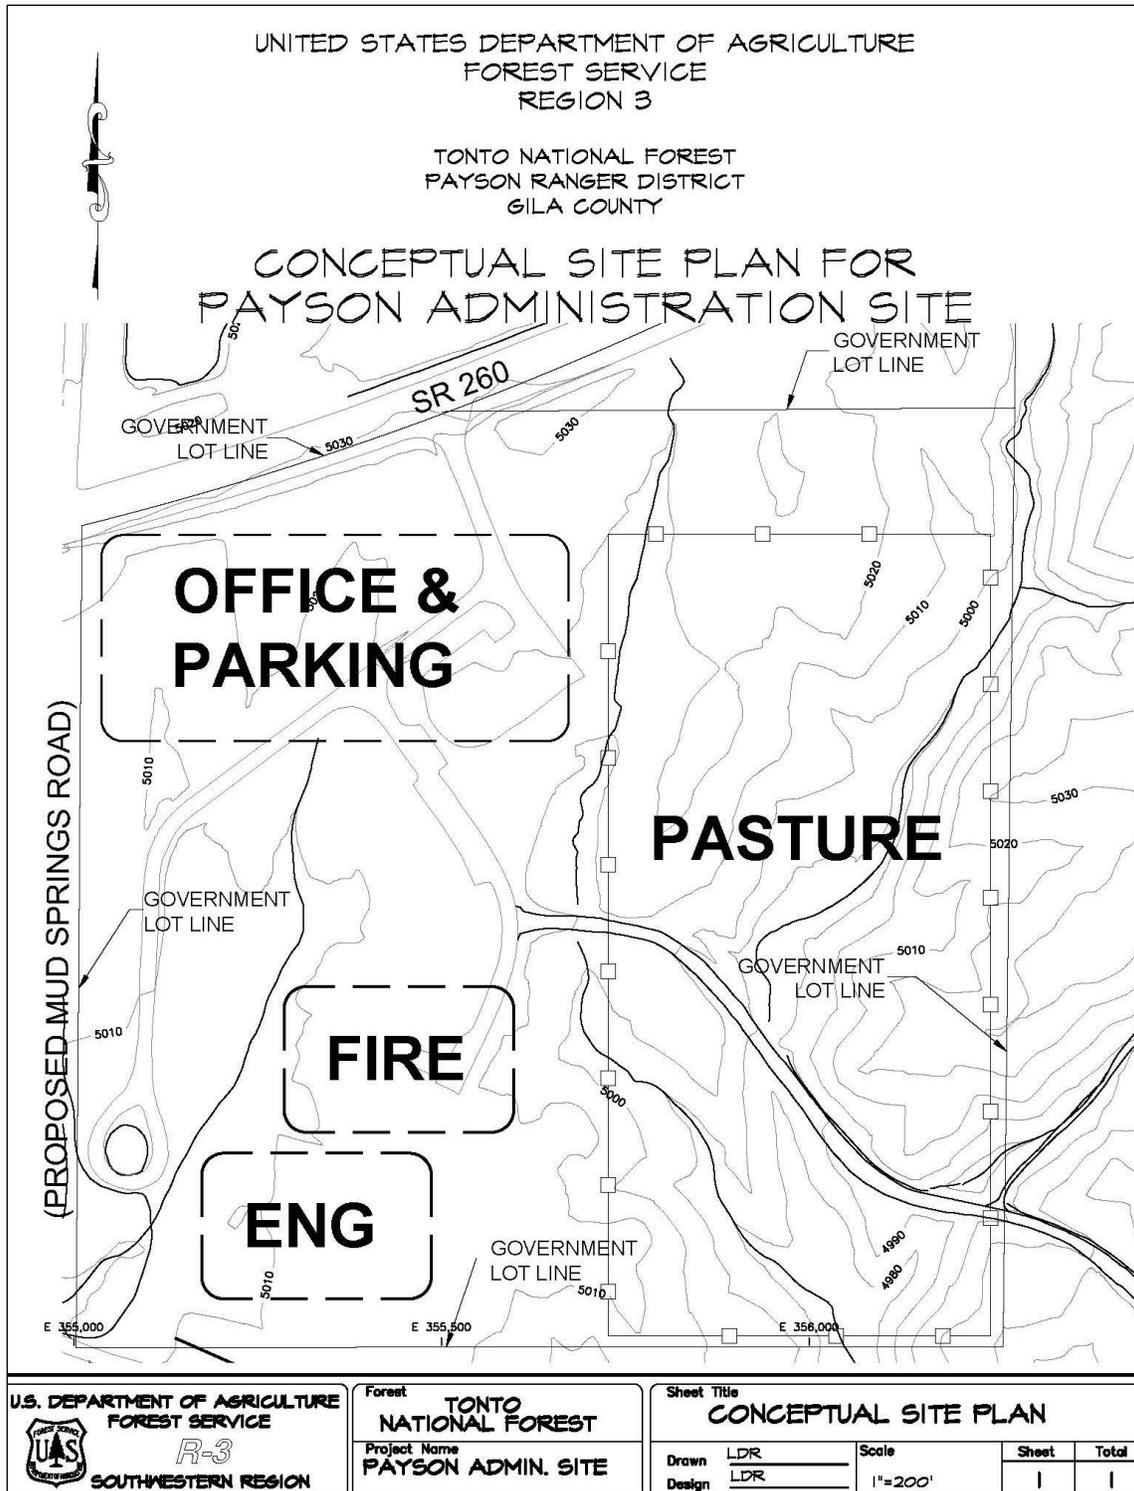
Land proposed for Retention–Payson Administrative Facilities Conceptual Site Plan
